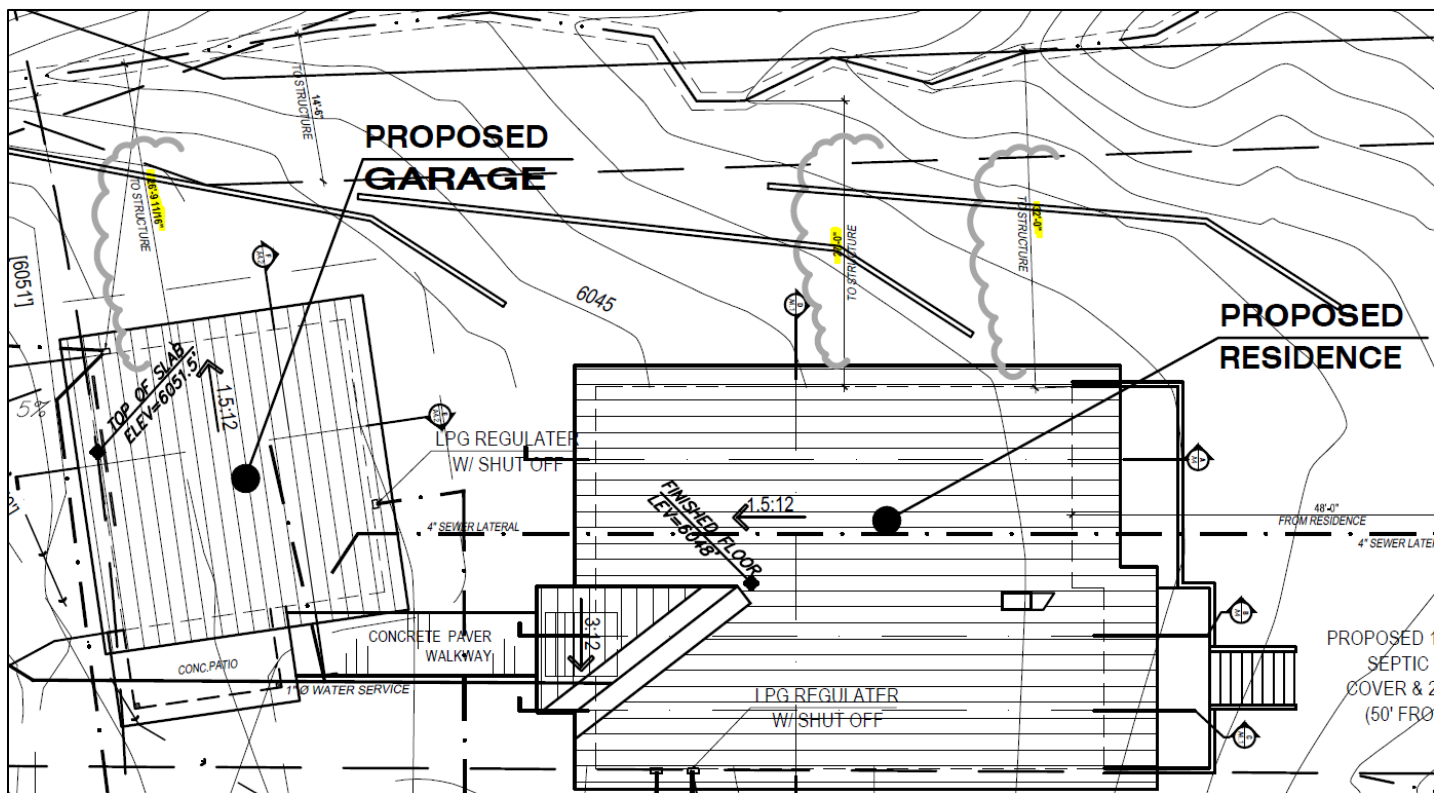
Enlarged Site Plan, Stream Encroachment Distances
